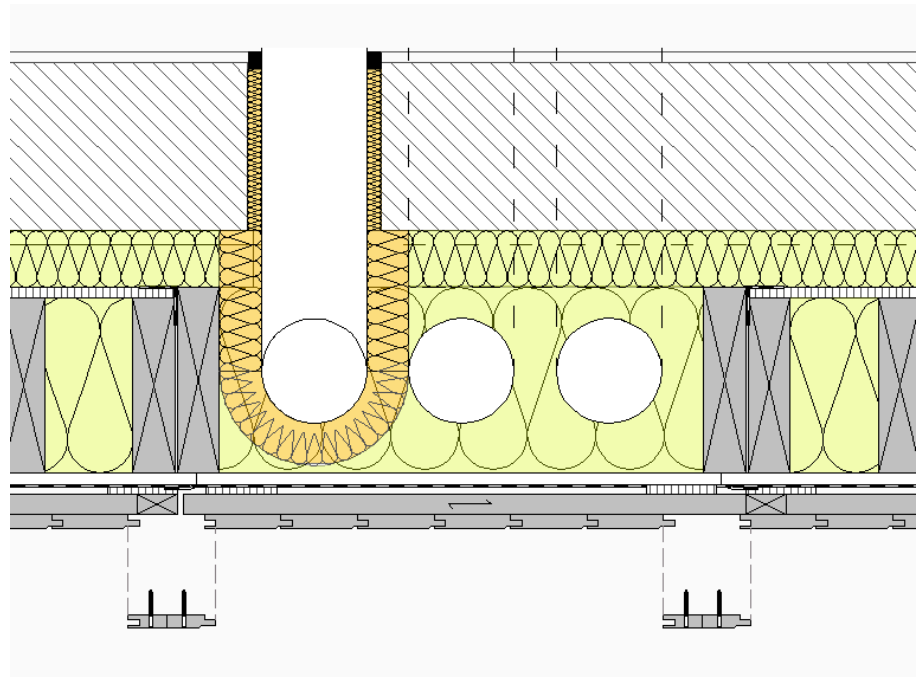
Example: Horizontal section of vertical TES module with HVAC ducts inside. Mineral wool insulation (≥ 60 mm) wrapped around ducts for fire protection.
